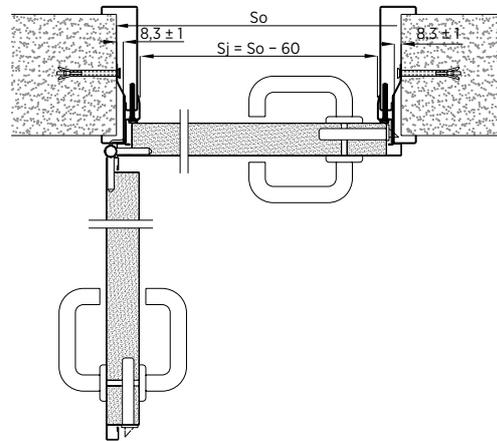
Installation of the single-leaf door with a wrap-around frame, horizontal cross-section
